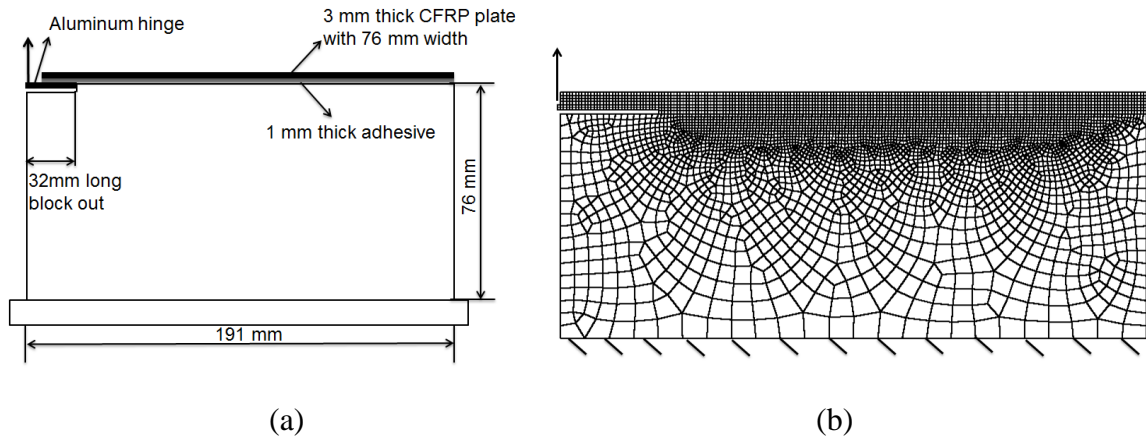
MDCB specimens: (a) specimen dimensions, (b) typical mesh
